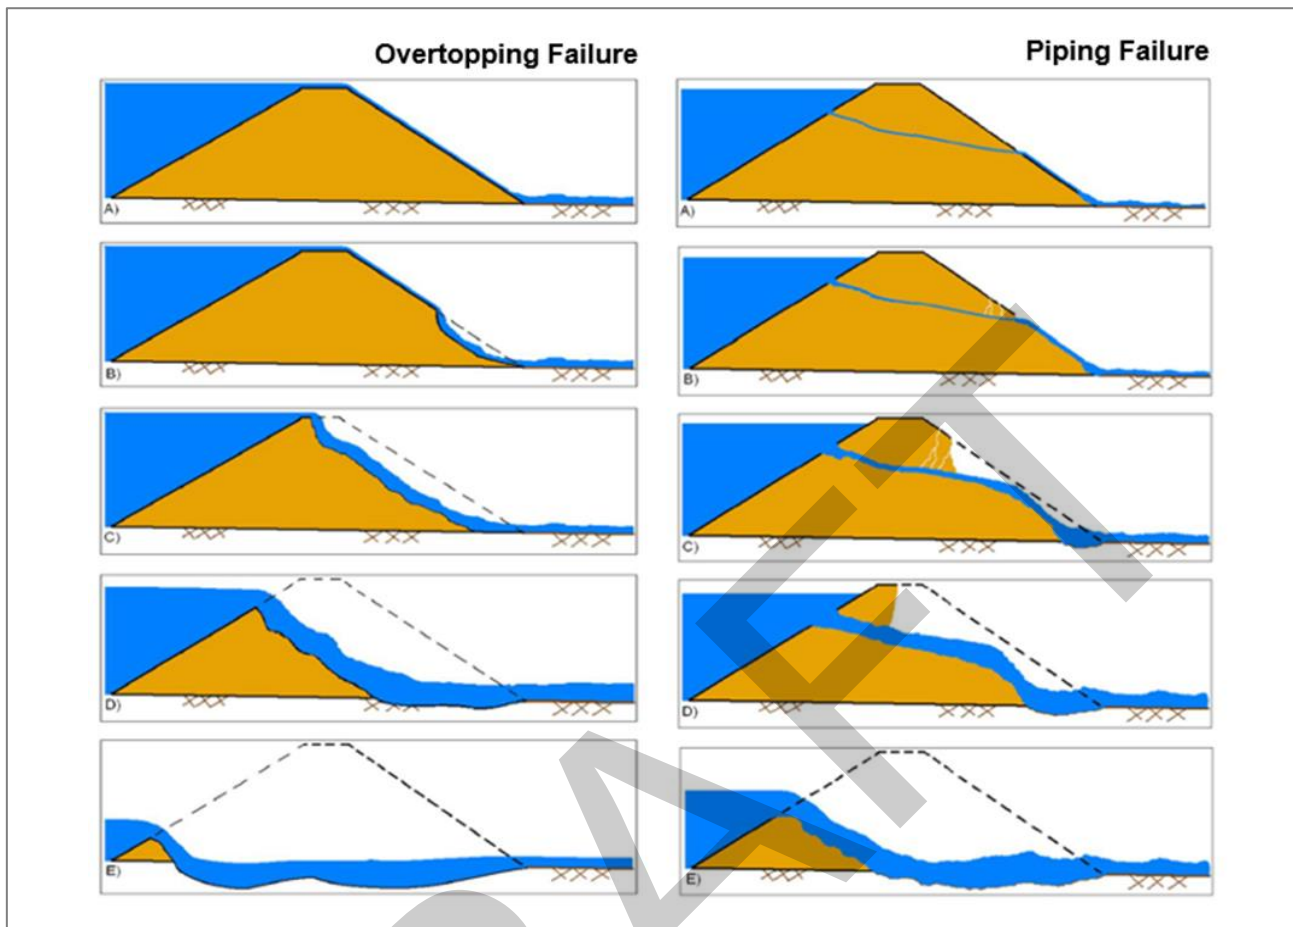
Overtopping and Piping Failure Configuration (US Army Corps of Engineers, 2014)
